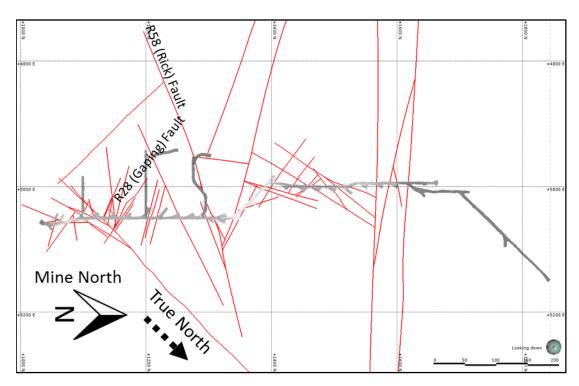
Plan section through existing infrastructure of 2017 structural model. Faults offsetting mineralization are labelled. Mine grid north and true north are referenced.
